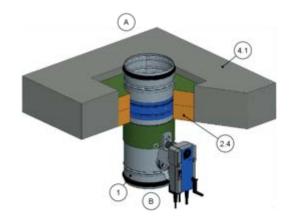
79: Dry mortarless installation into a solid ceiling slai	b, with a fir	e batt, upright
